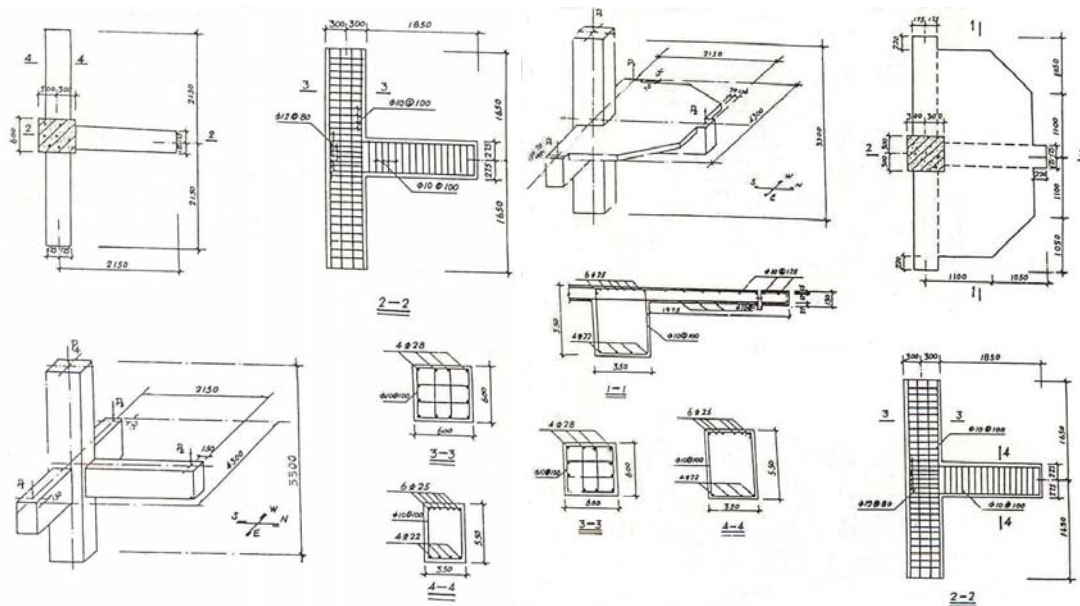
Specimens details, Bolong and Yuzhou (1991)
